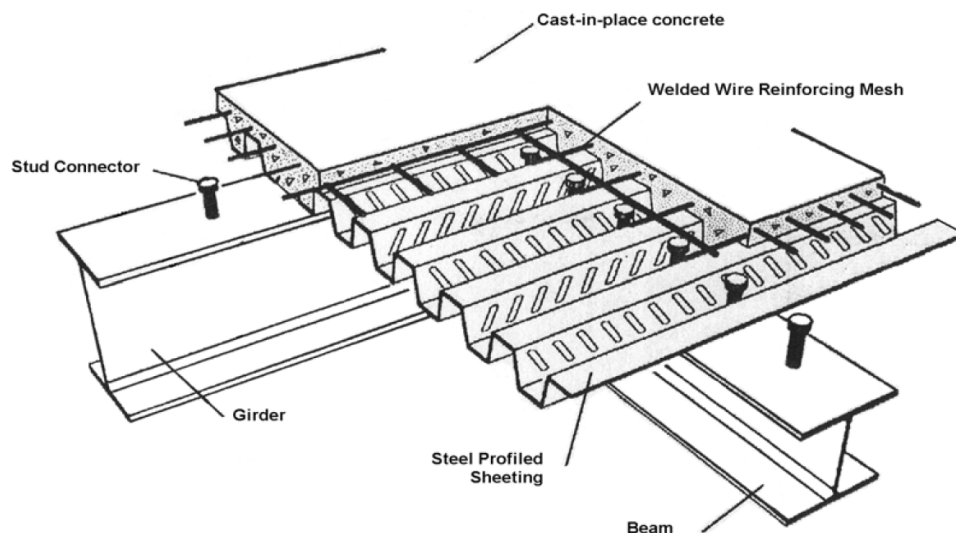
Configuration of a typical steel-concrete composite slab with trapezoidal decking (G. Mohan Ganesh *et al.*, 2006).
